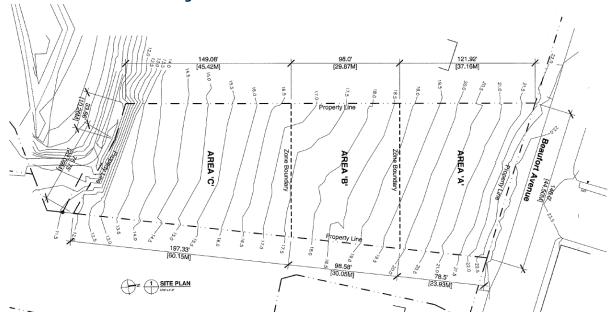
1829 Beaufort Avenue Sub-Areas
